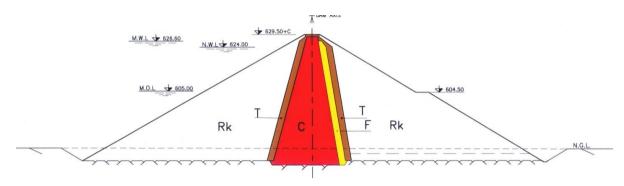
A Cross-Section of the Rockfill Section of Gurara Multipurpose Dam Embankment. Source: Final Design Technical Report, Gurara Dam, 2002 [10]
